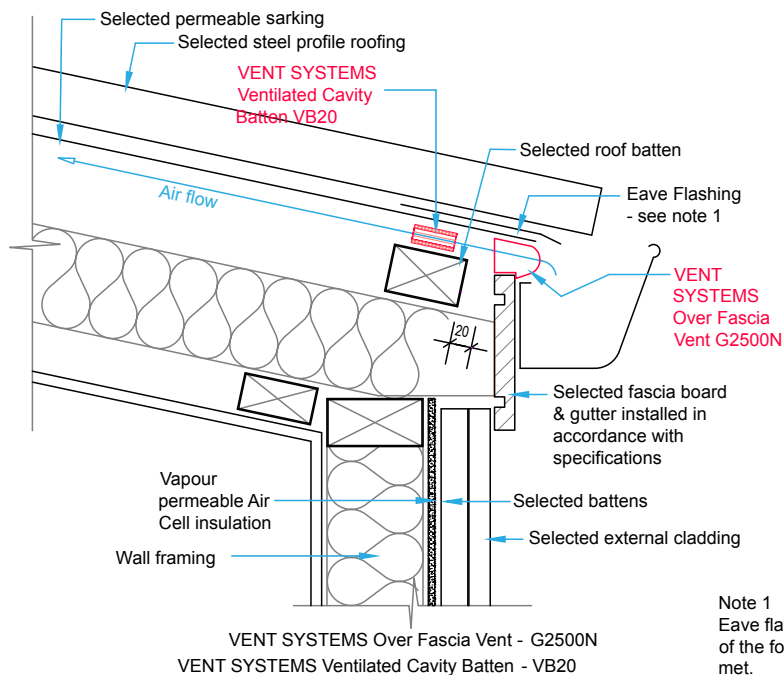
Fig D: Cathedral Roof Detail - Sarking above the roofing batten
